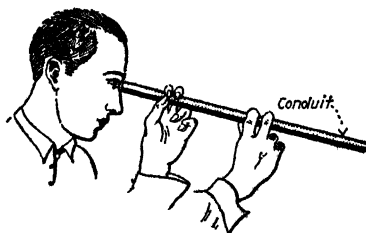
Inspecting conduit for burrs or other obstructions.
